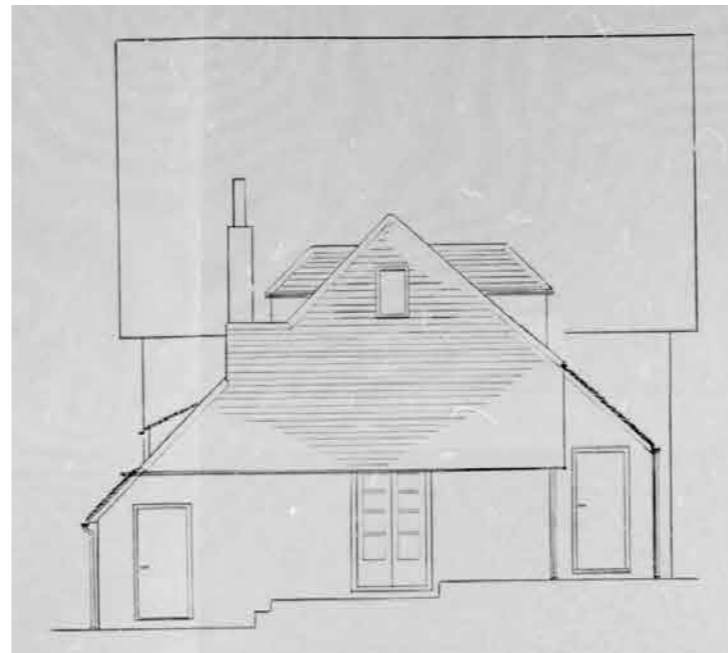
Previous approval REF: 82/P/0425 - Proposed Side Elevation (NTS)
